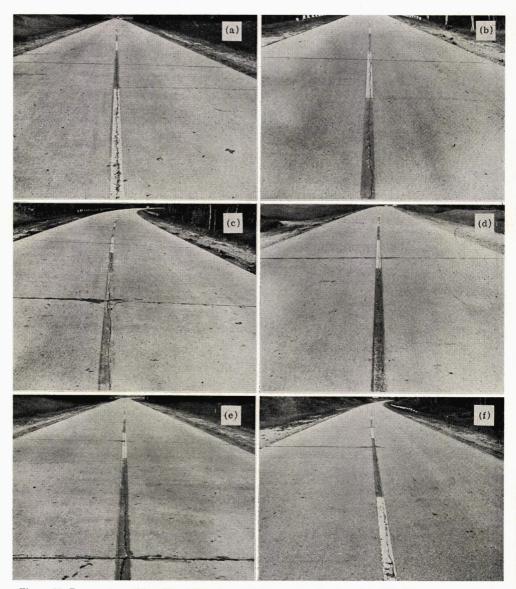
Pavement condition, May 1957; air-entraining agents, showing: (a) AEA No. 1, cement No. 1, Section 4F, Sta. 464+50; (b) AEA No. 2, cement No. 1, Section 5A, Sta. 519+00; (c) AEA No. 1, cement No. 2, Section 4H, Sta. 488+40; (d) AEA No. 2, cement No. 2, Section 5C, Sta. 549+00; (e) AEA No. 1 with 1 percent CaCl₂, cement No. 1, Section 4F-1, Sta. 465+50; (f) AEA No. 2 with 1 percent CaCl₂, cement No. 1, Section 5A-1, Sta. 532+50.
